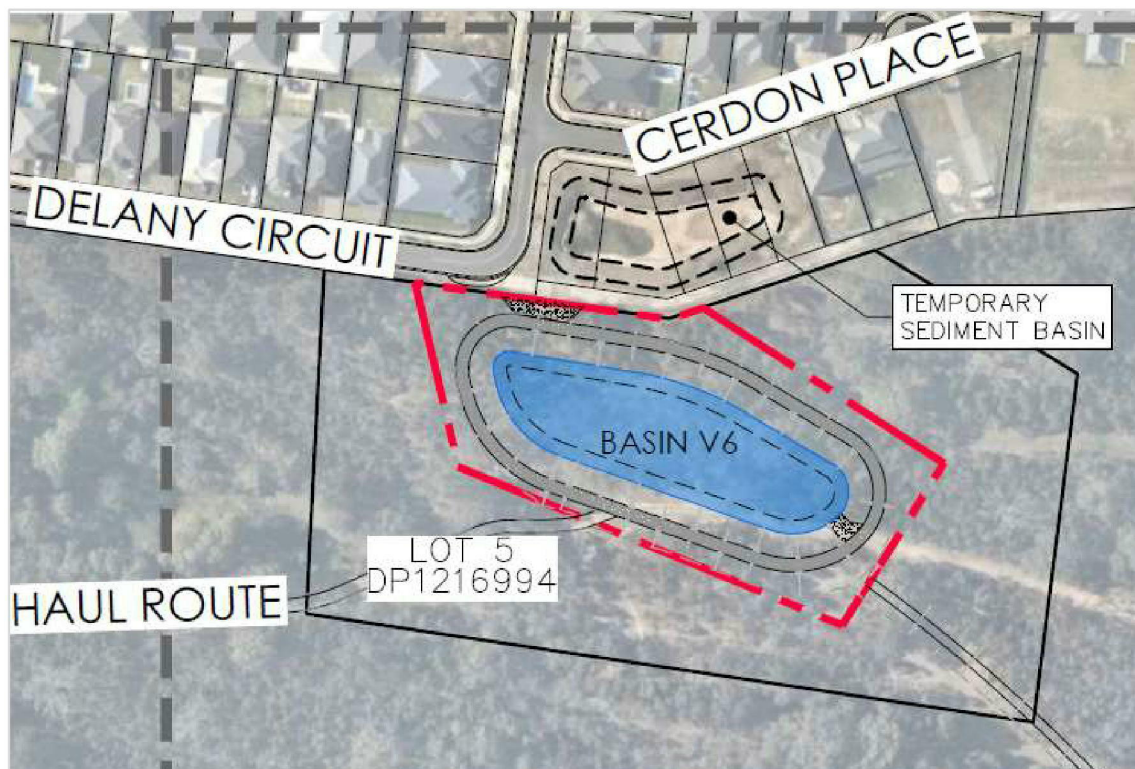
Proposed Basin V6 layout (Source: ADW Johnson)
